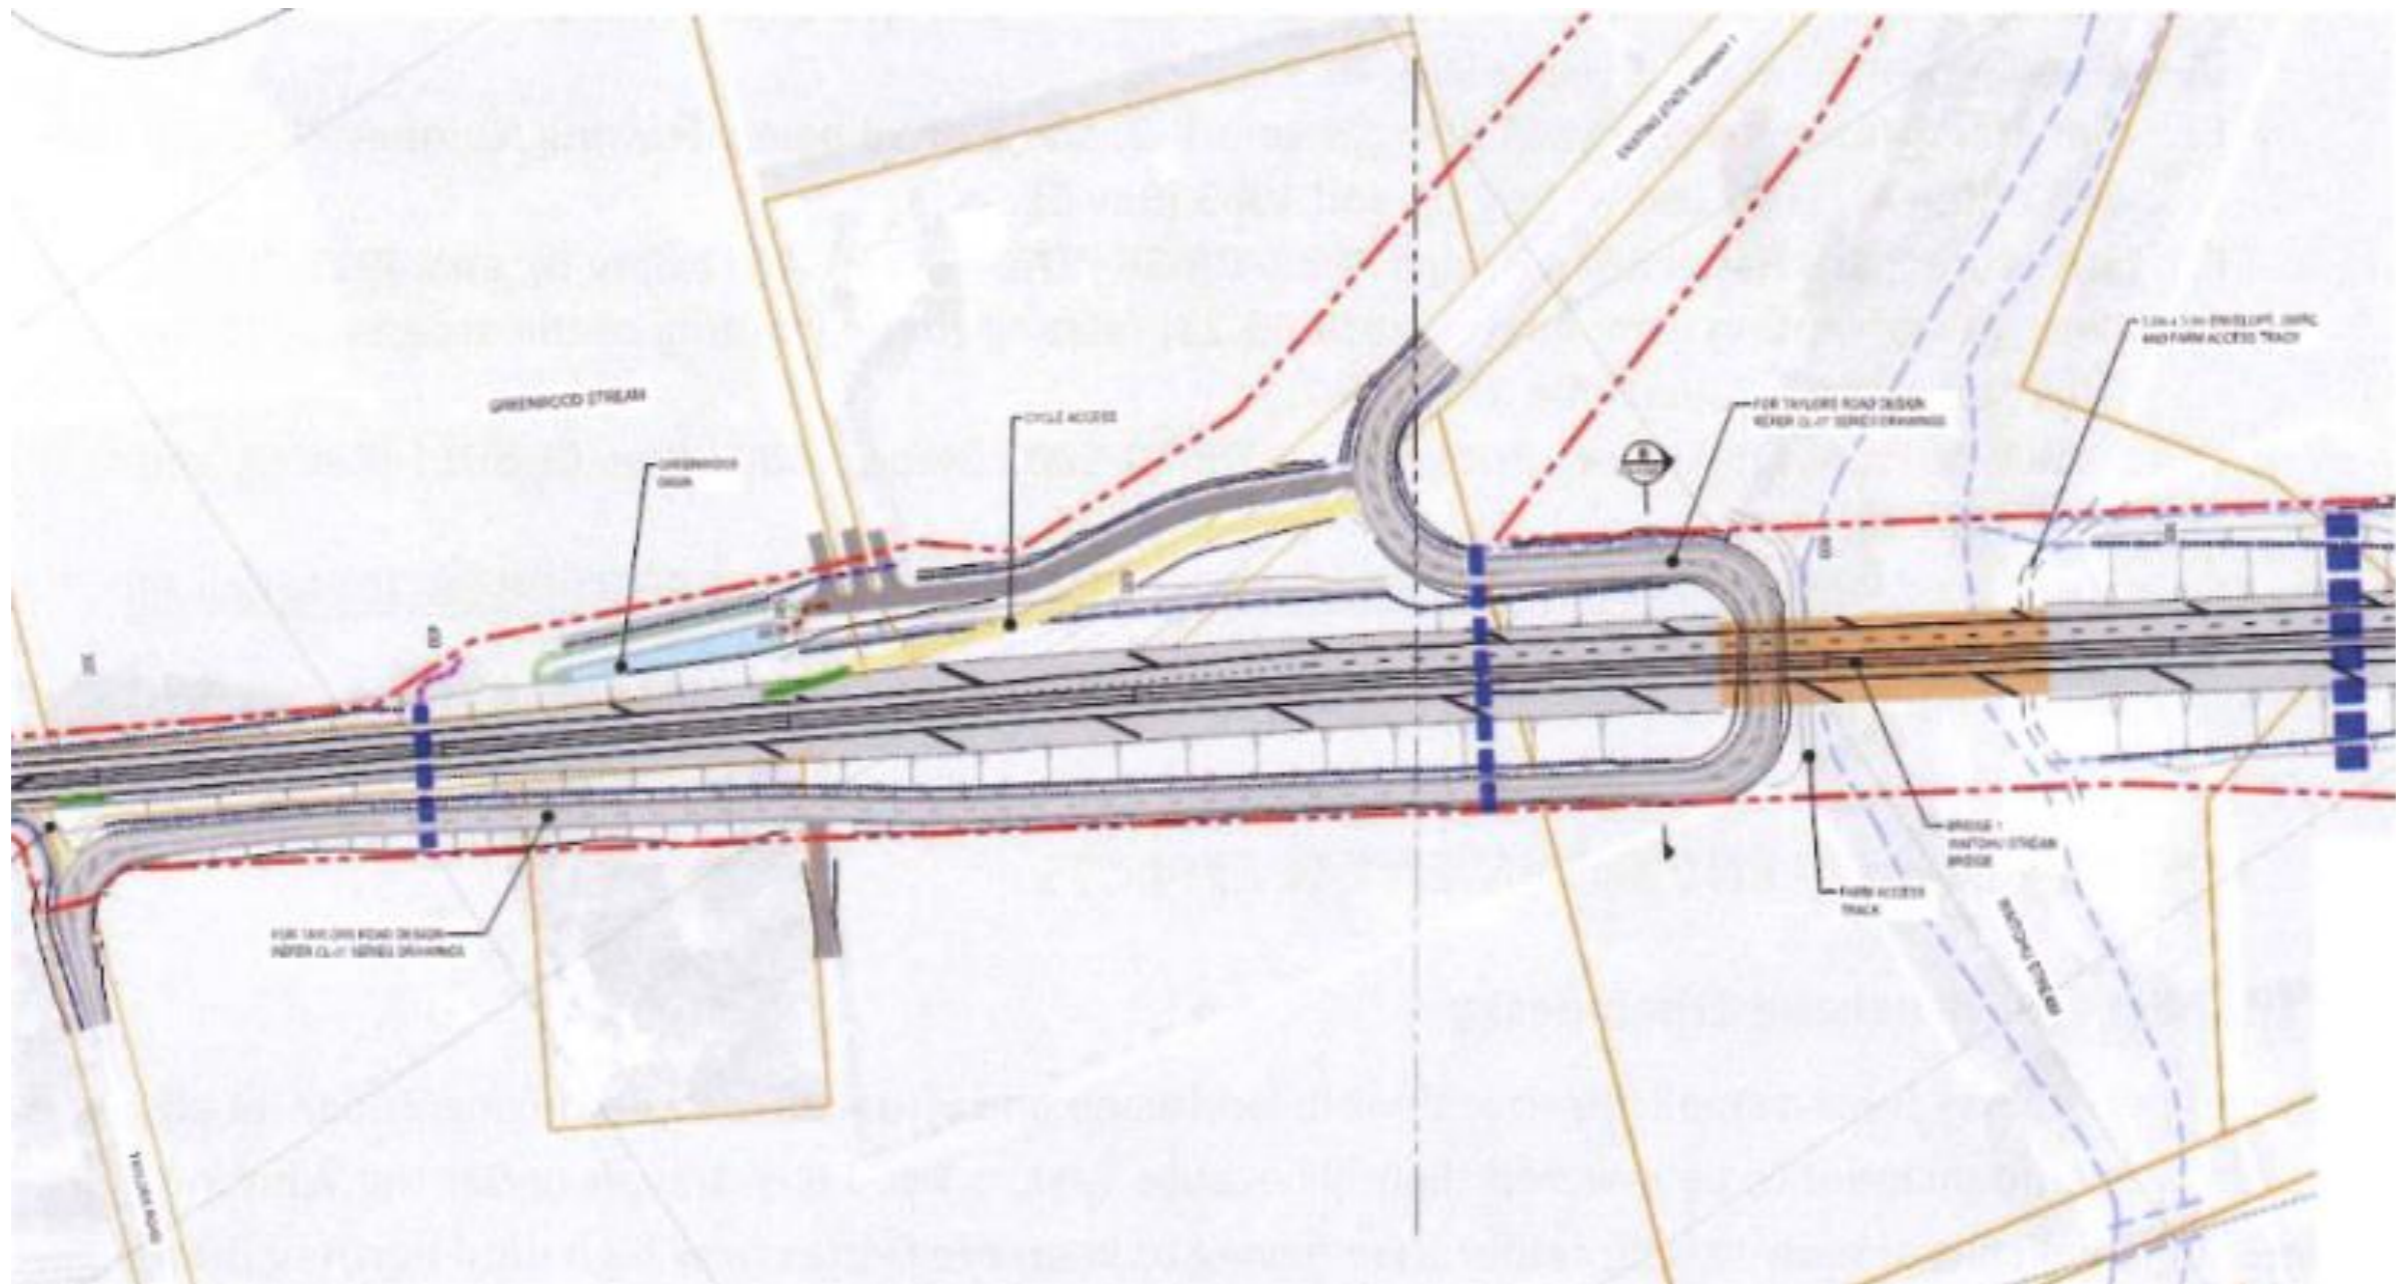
Plan showing Taylors Road Alteration under Waitohu Stream Bridge
